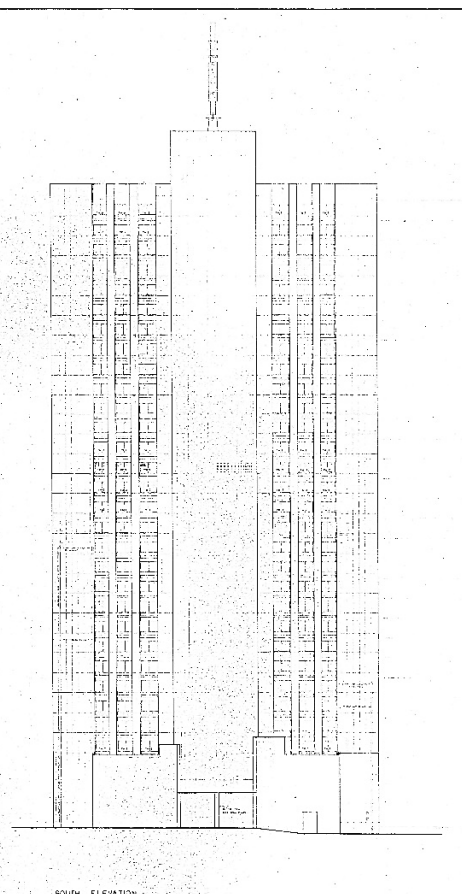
Architectural drawing of the south elevation, dated 1969 (BAP).
